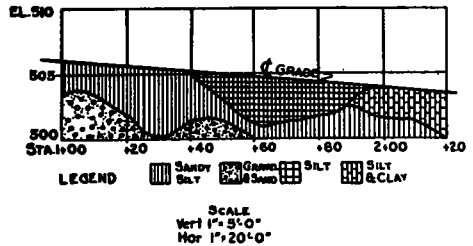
Subgrade Soil Profile and Cross-Section of a Road Treated with Calcium Chloride.
